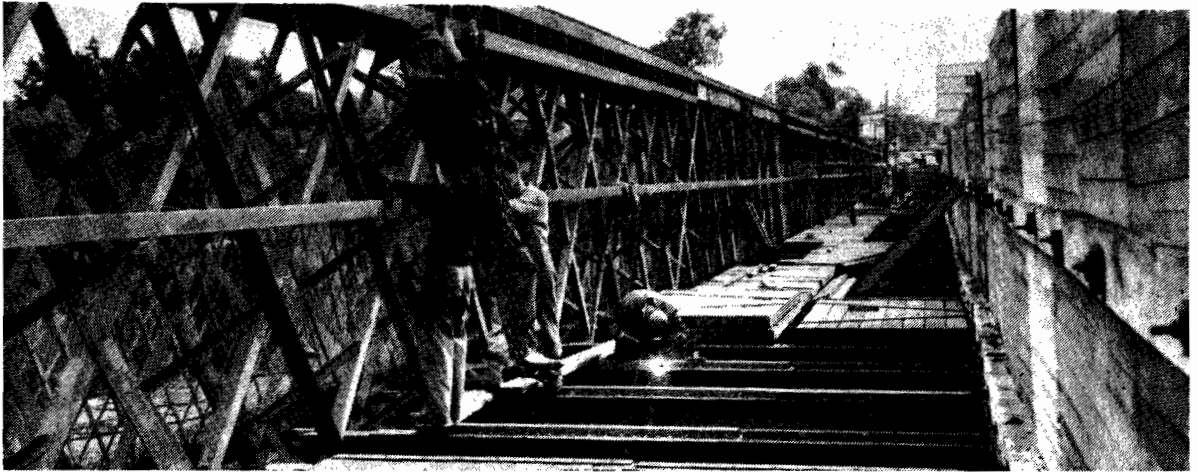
Reconditioning old bridge on Chandler Highway over Yarra River.
